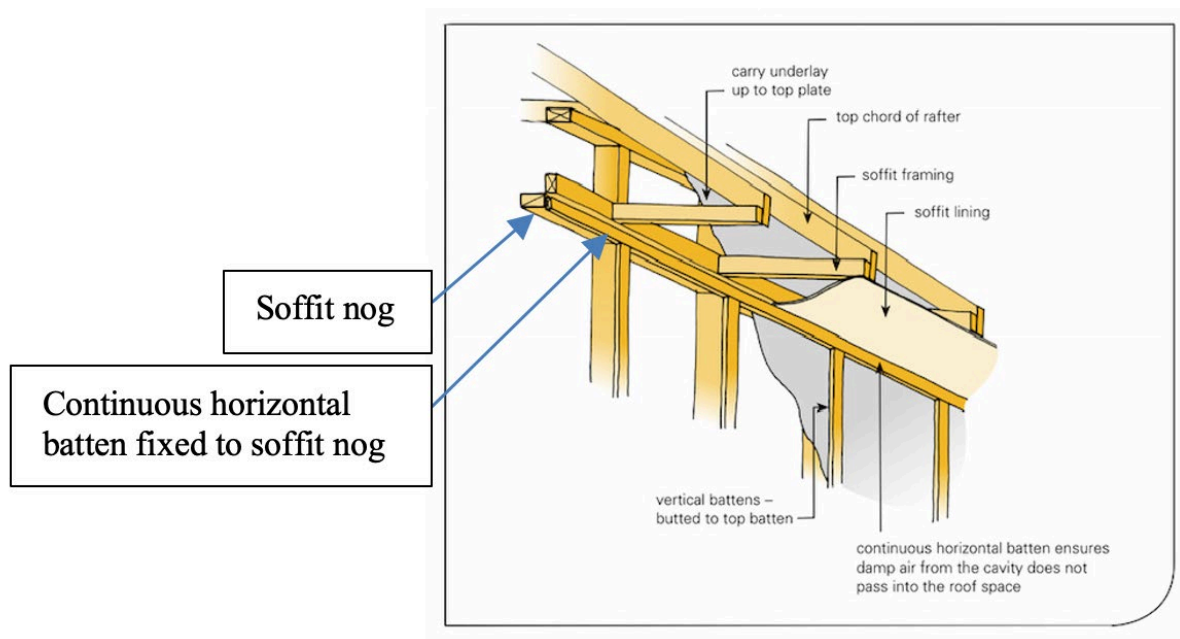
Illustration showing soffit nog 'closing off the top of the cavity' in MBIE's 'Constructing Cavities for Wall Claddings' document
